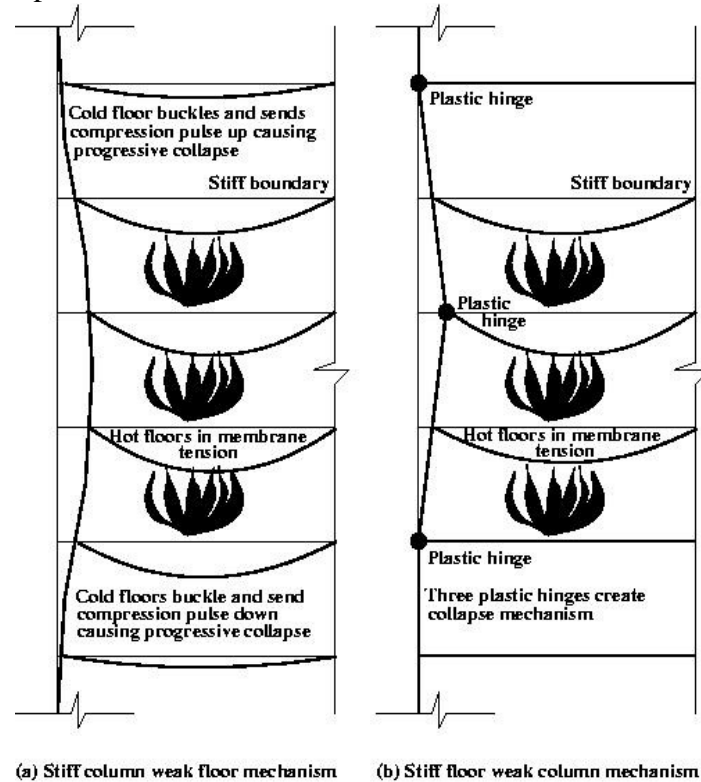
Suggested collapse mechanisms for WTC towers structure in fire
